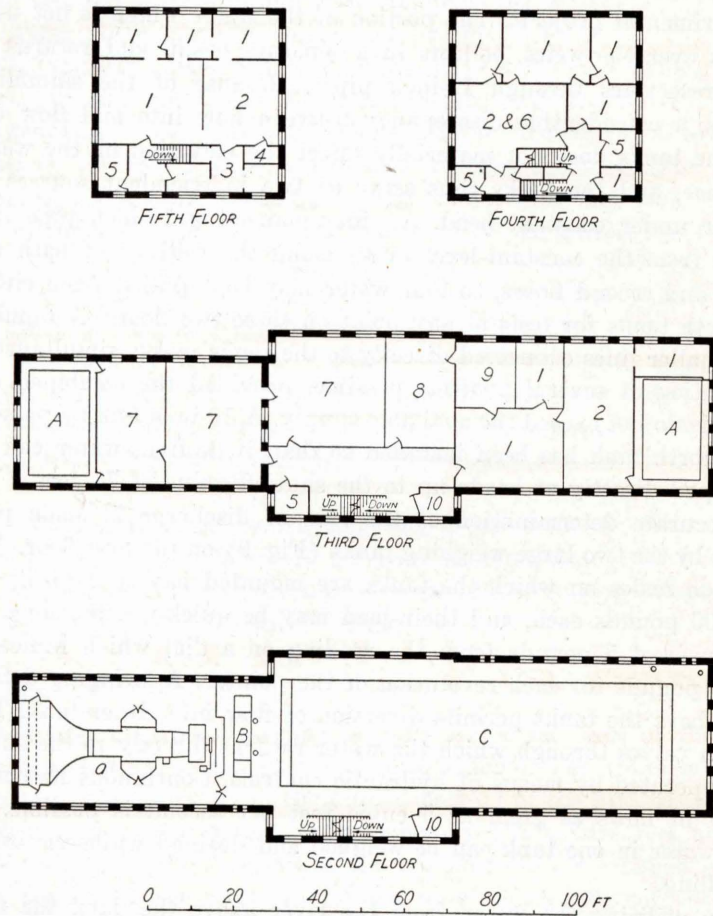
PLAN VIEWS OF SECOND, THIRD, FOURTH, AND FIFTH FLOORS.
